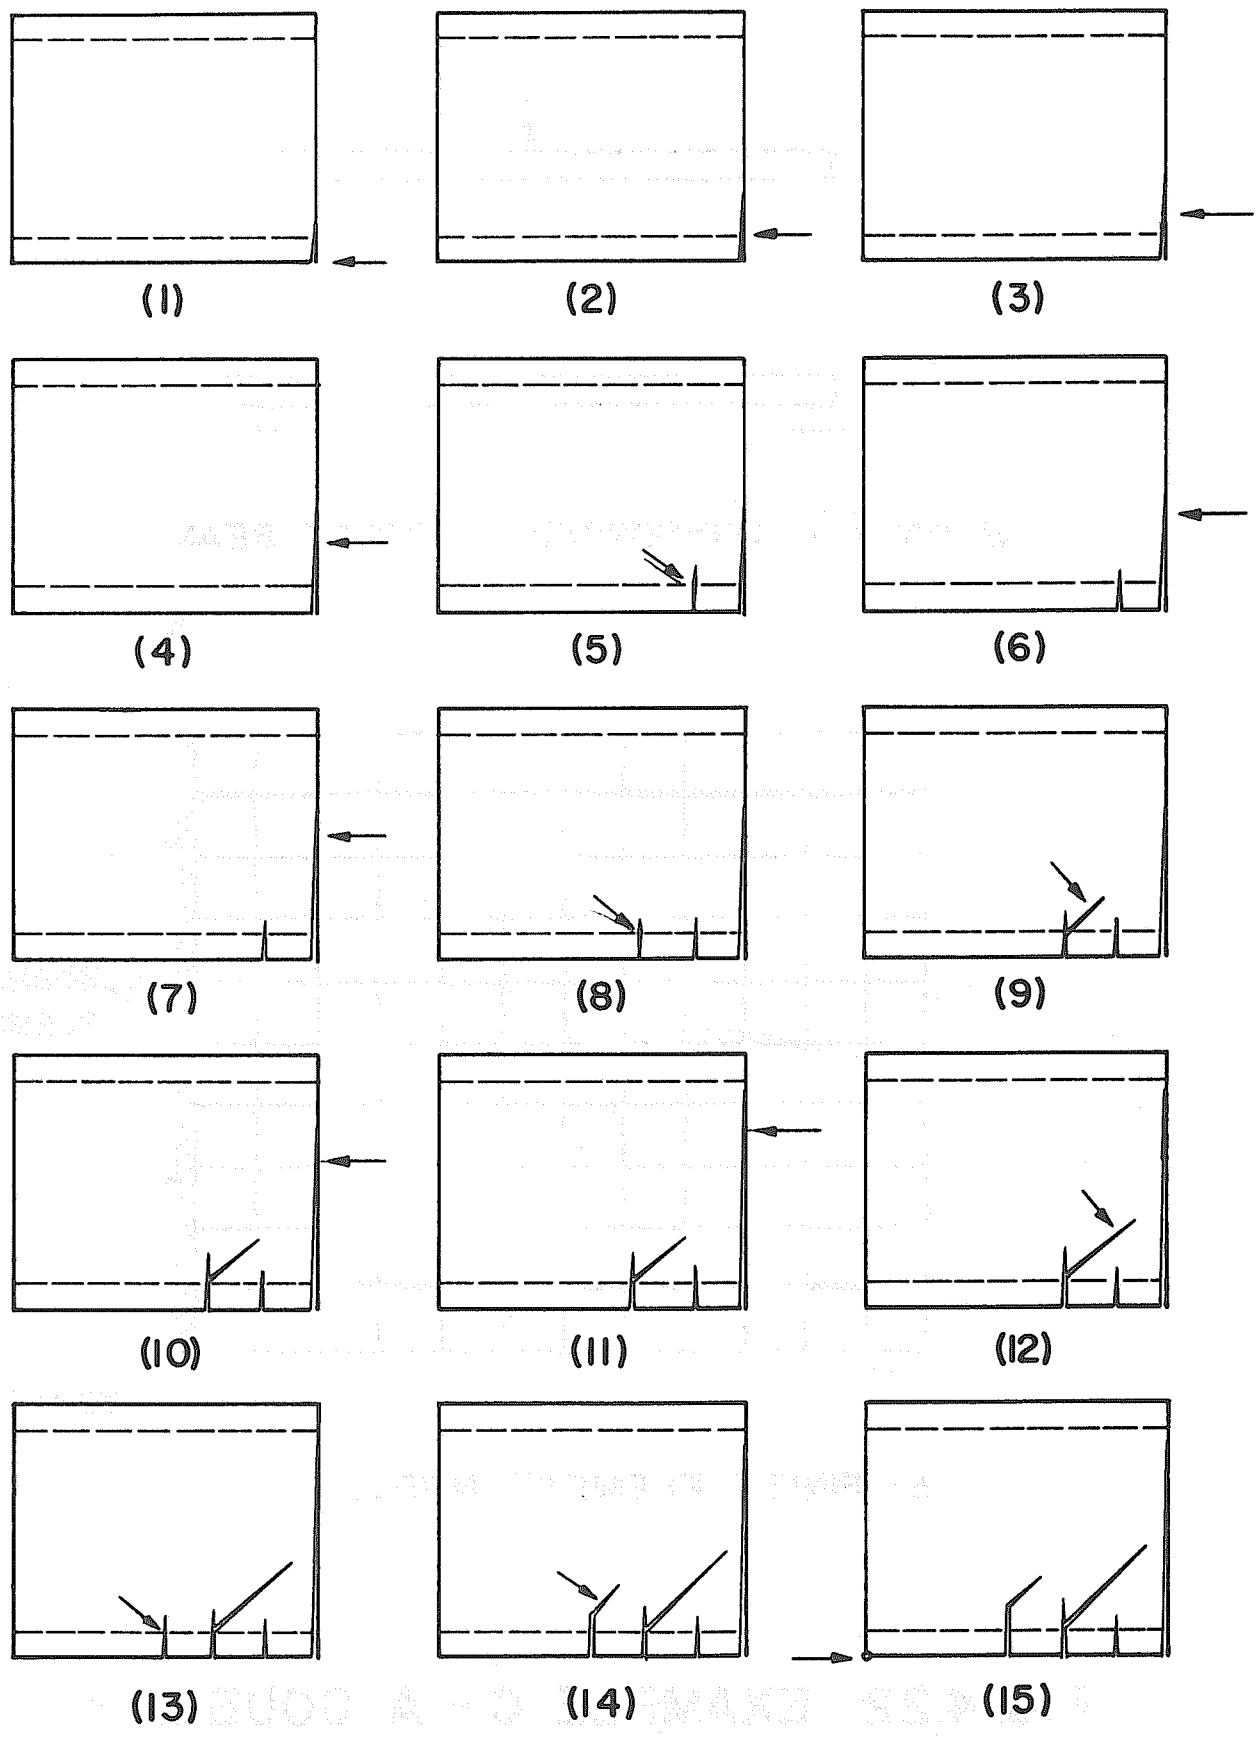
CRACK GROWTH OF EXAMPLE C
